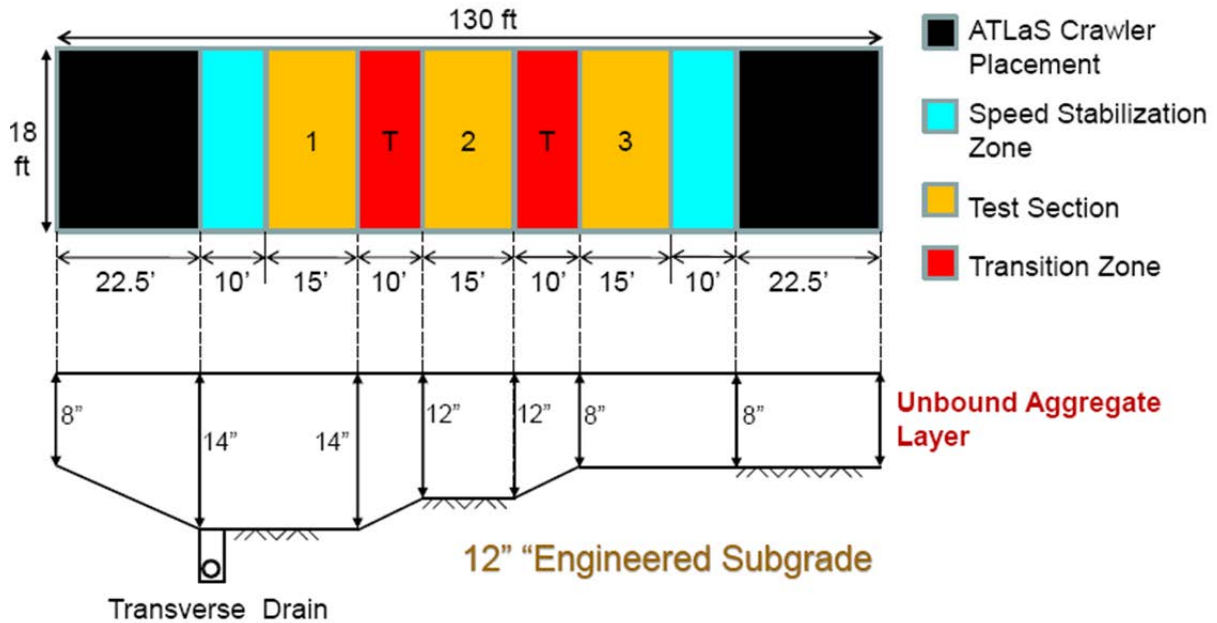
Plan view (on top) and cross-sectional details of representative full-scale pavement test sections.
